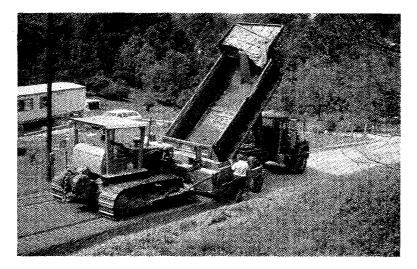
Spreading fly ash-stabilized roadbase after central plant mixing.
